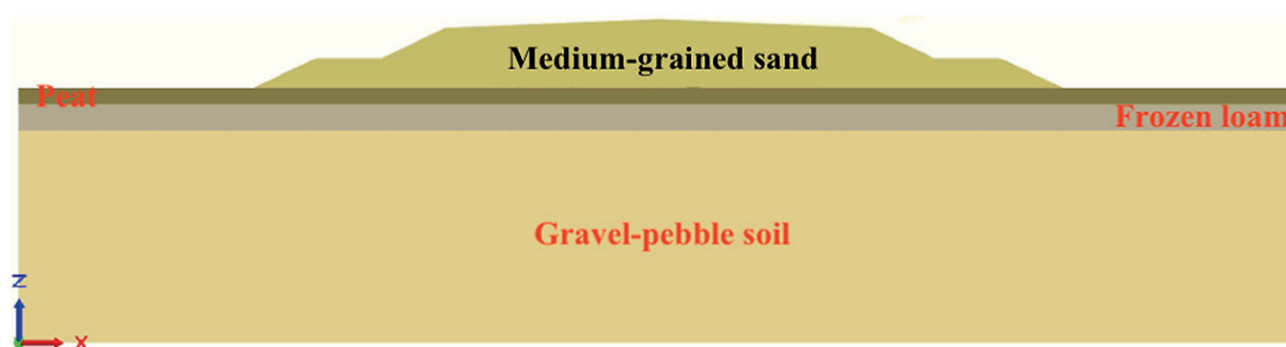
Embankment structure without reinforcement for the section of the Trans-Baikal Railway
